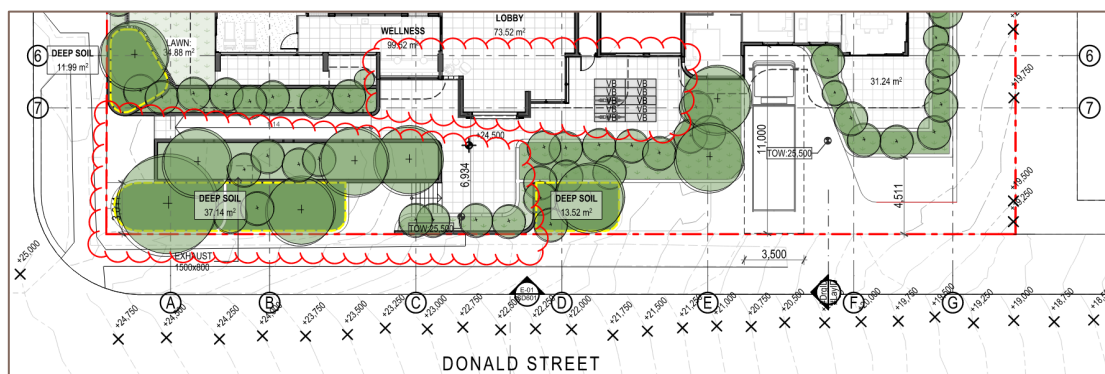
DRP meeting - Ground Floor Plan - Issue AE
